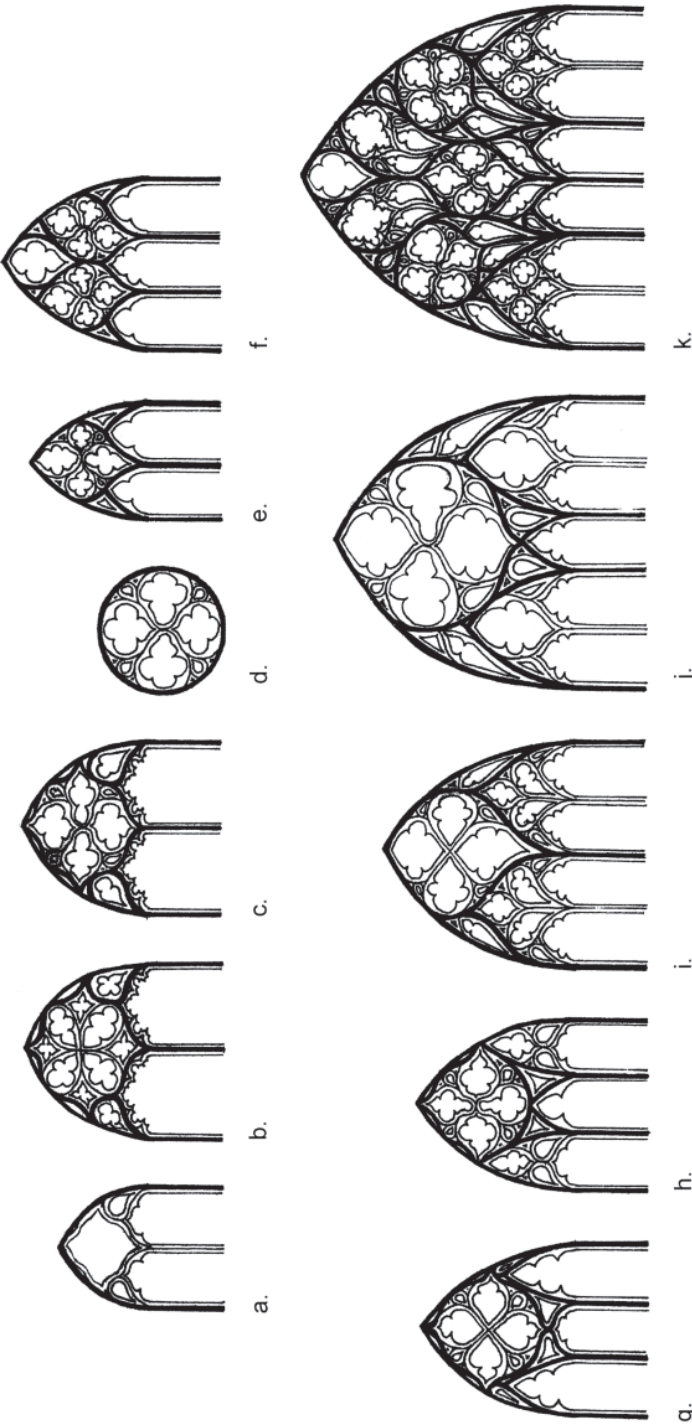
Diagrammatic sketches of window tracery (not to scale): a. King's Lynn St Margaret, upper belfry stage of south-west tower; b. Ely Cathedral, choir gallery except in south-west bay; c. Ely Cathedral, choir gallery in south-west bay; d. Terrington St John, nave clerestory; e. Snettisham, nave; f. Snettisham, south transept; g. Snettisham, south transept; h. Grantchester, south side of choir; i. Ely Cathedral, choir clerestory in south-west bay; j. Heacham, west window; k. Snettisham, west window
